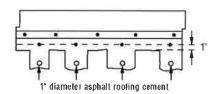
Fastening Presidential and Presidential T/L Shake sbingles on steep slopes.
